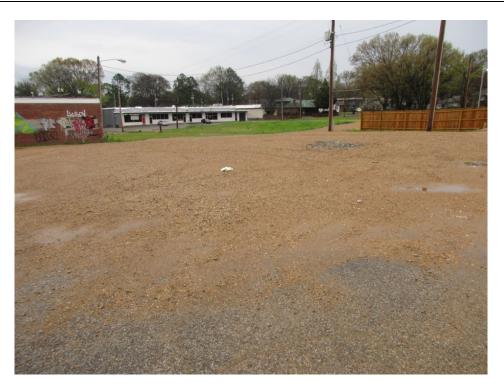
Former Custom Cleaners/Sharri's Discount Art Supplies building location. After building demolition and soil removal, gravel was part of the fill material brought onto site to fill the source area soil excavation. View is to the southeast toward nearby business strip center housing a rug cleaning company and vacant storefronts on Minor Road. (Photo credit: J. George, 3/27/17).
